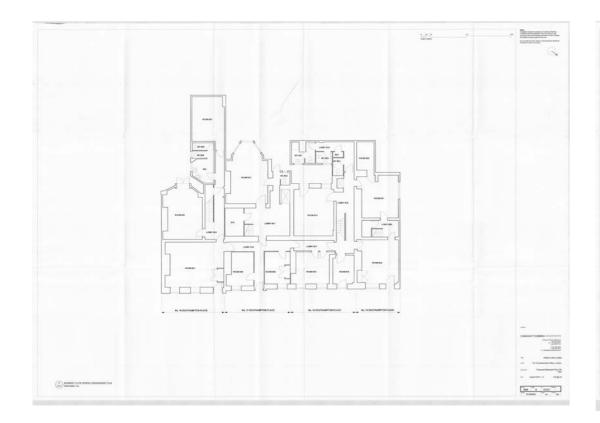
(Above, Left) - Basement Floor Plan, as Existing (Canaway Fleming Architects, 2010).
